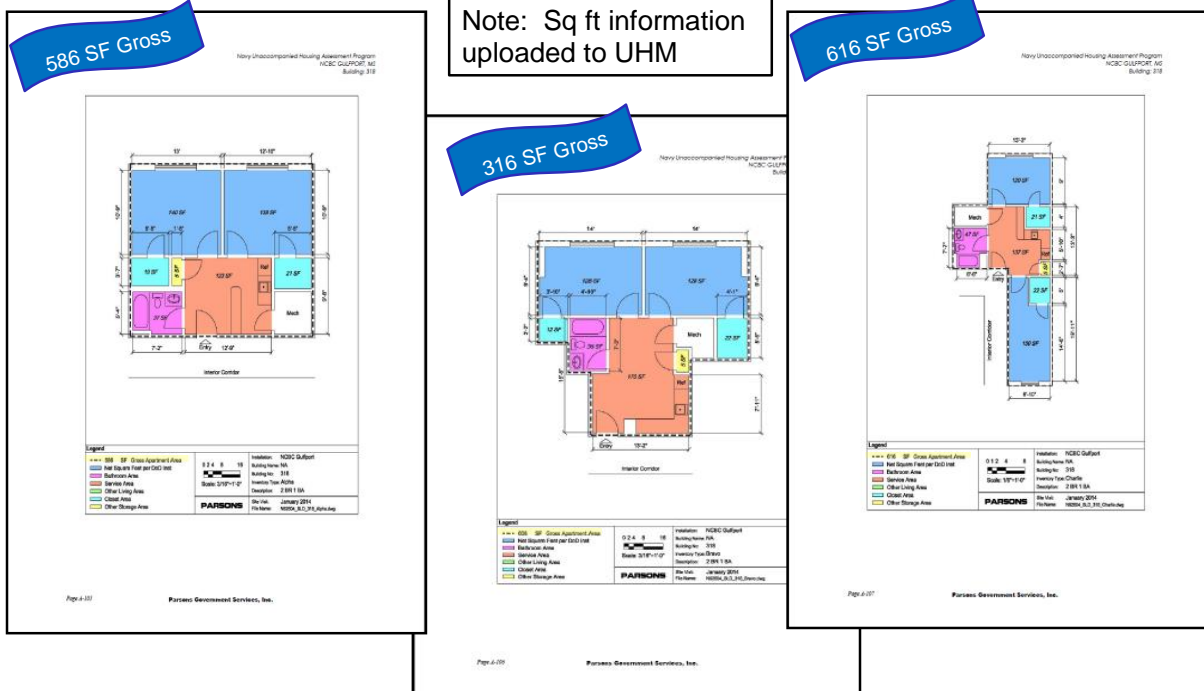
, Typical UHAP Unit or Room Type Floor Plans
